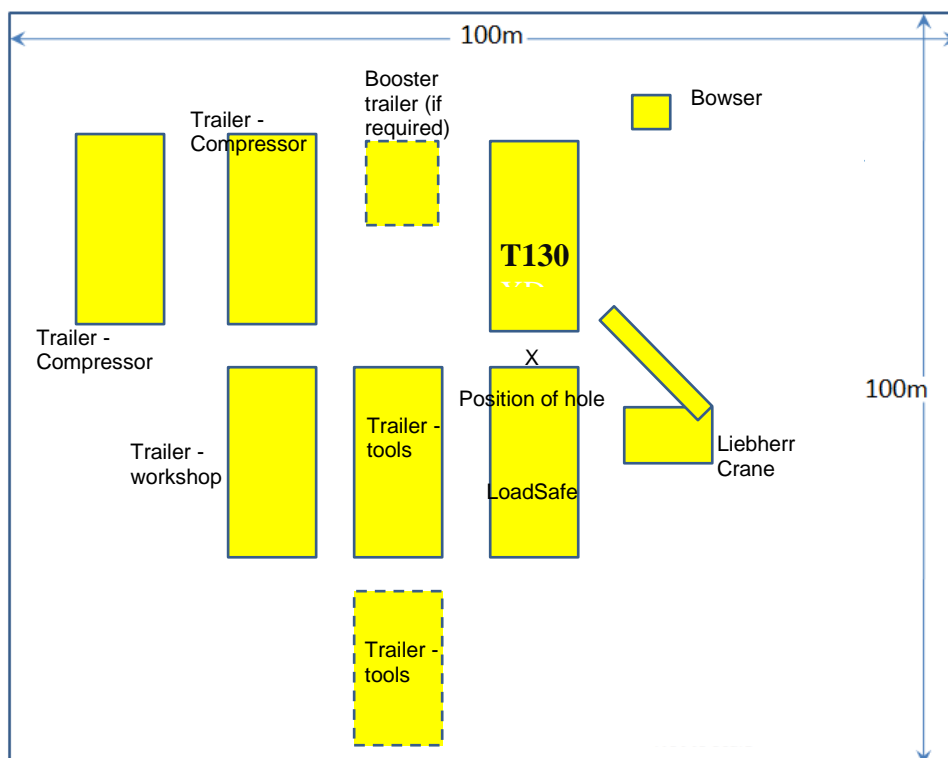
General layout of the T130XD deployment for drilling a 660mm rescue hole. Note that additional rod trailers are required for deeper holes. CTC management will advise the number of rod trailers that will be deployed.
